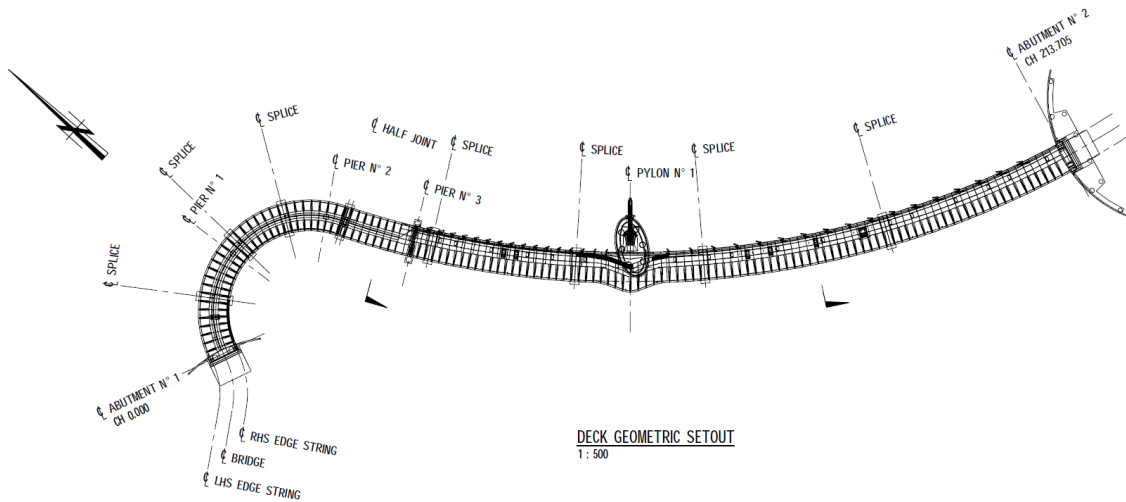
Plan view of Point Fraser Bridge, the point is at the pylon
